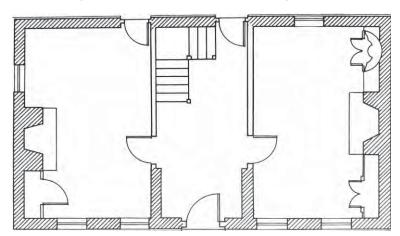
Typical single-pile, central passage floor plan (from Lanier & Herman 1997:27)
